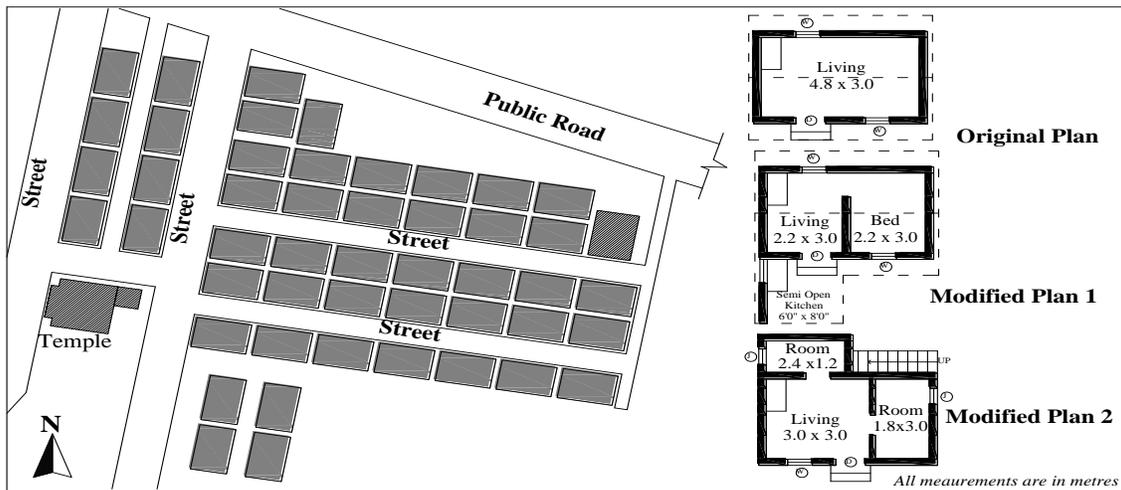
Site Layout and original /modified unit plans of Public housing at Thanakankulam, Madurai
